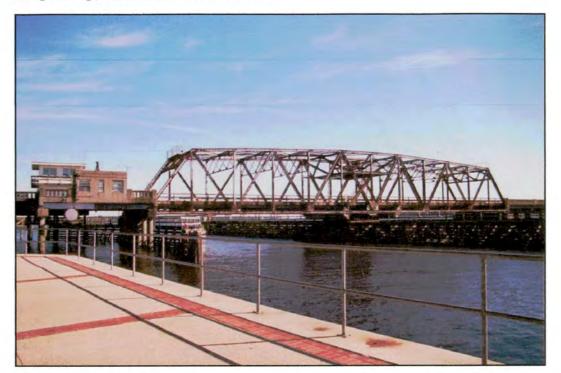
West elevation. Truss, moved operator's house, and 1955 bridge tender house (view from New Bern Convention Center promenade).
